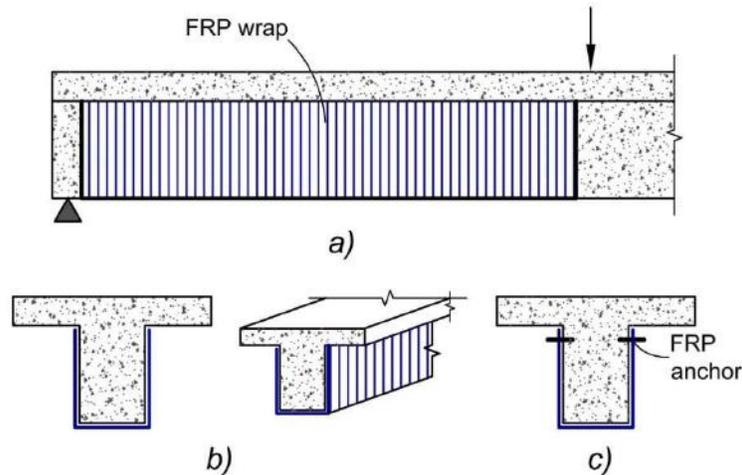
Seismic retrofitting of beams using FRP overlays (based on Triantafillou, 2006): a) beam elevation showing a region covered by the FRP wrap; b) beam cross-section showing 3-sided wrapping, and c) FRP anchors facilitate the anchorage and eliminate the need for drilling through the slab.
